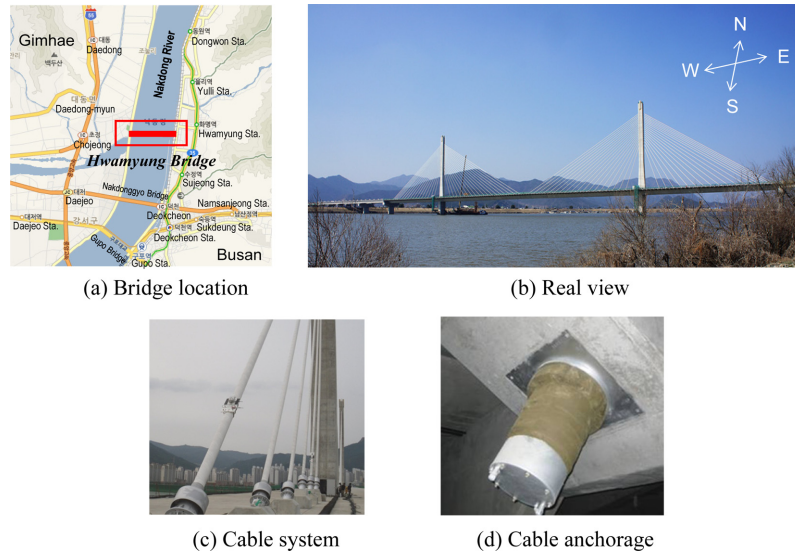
On-site view of Hwamyung cable-stayed bridge
